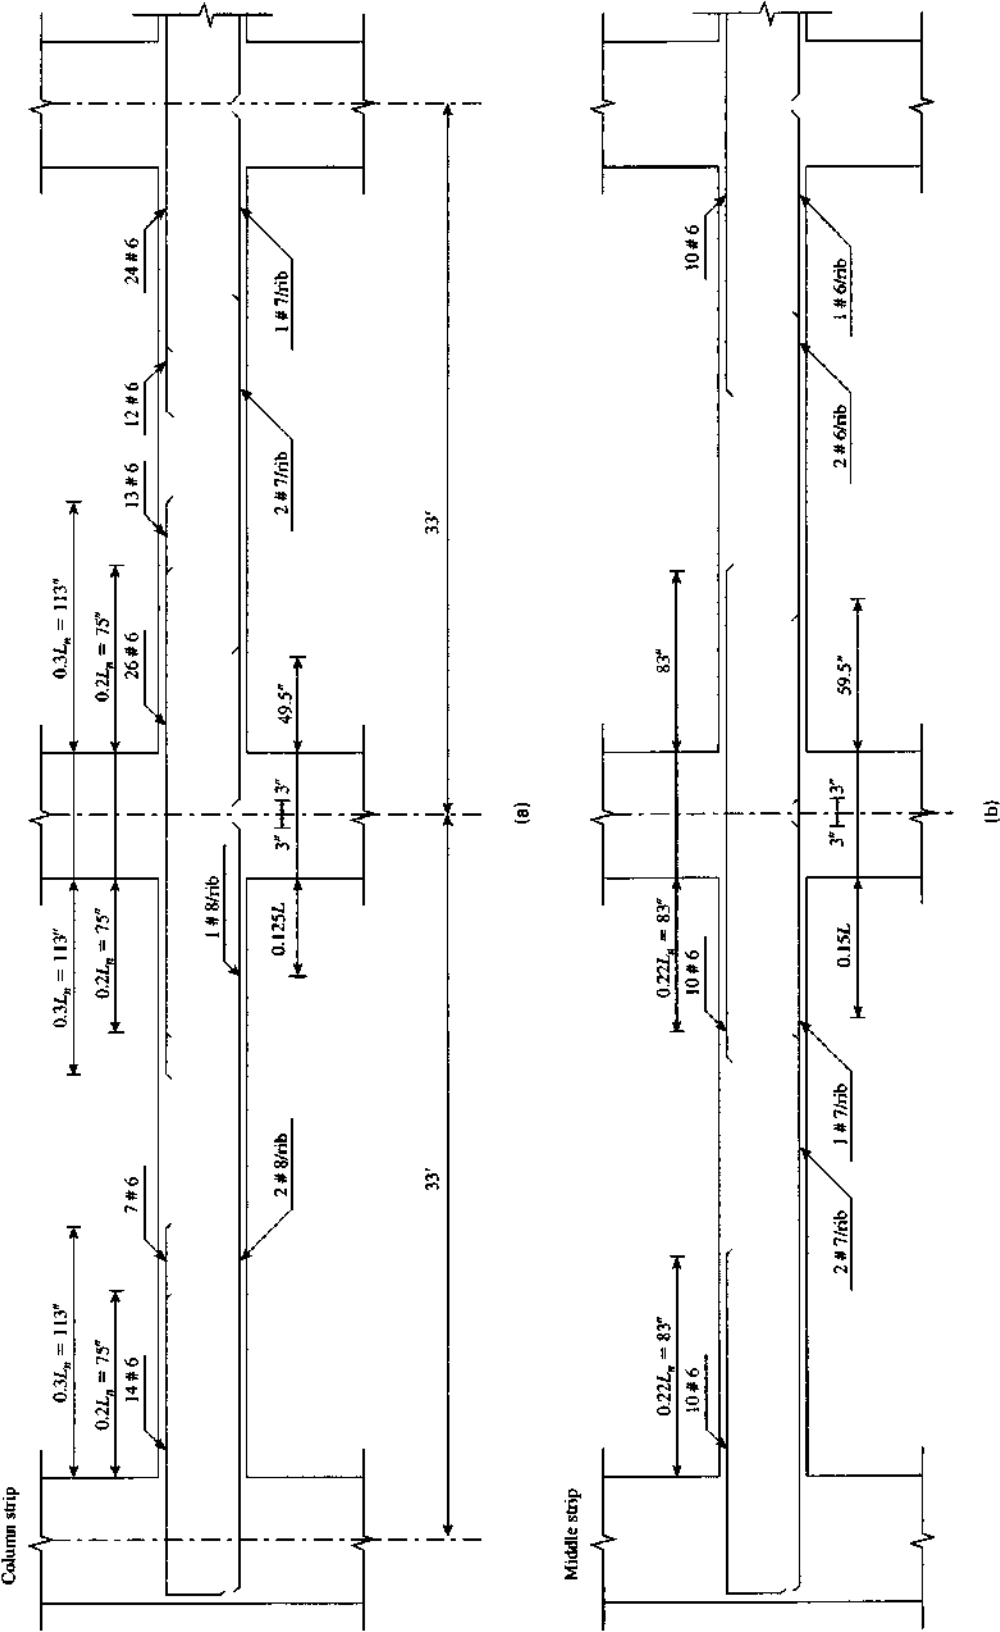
Example 17.12: reinforcement details of the waffle slab.
